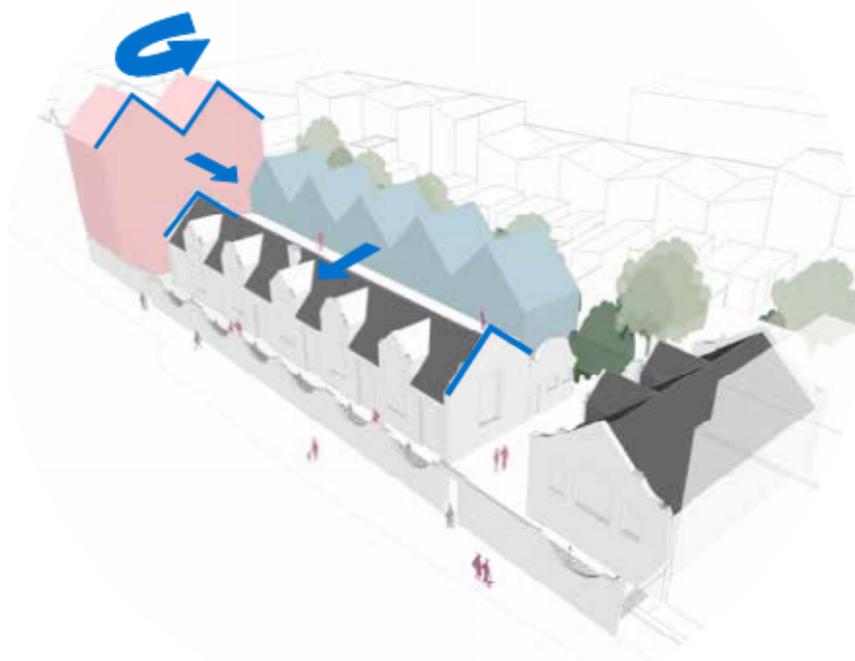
Diagram showing the siting and orientation of the buildings on site. (Illustrative only)
